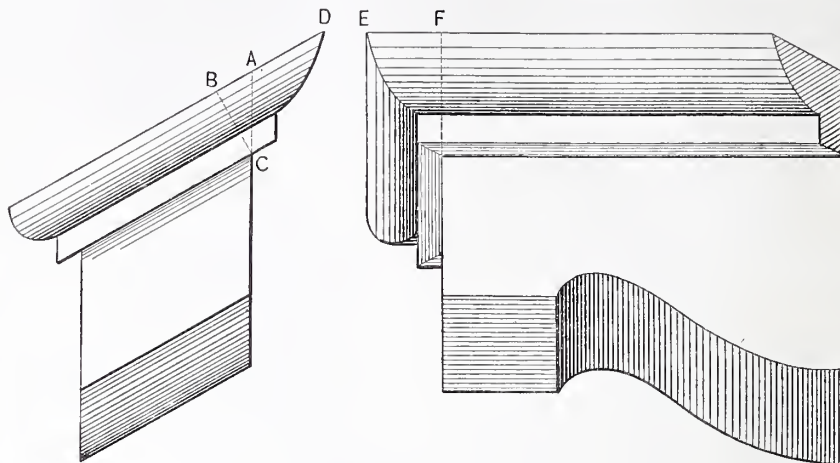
Front and Side View of Bracket, the Method of Cutting the Moldings for which is Shown Below.
